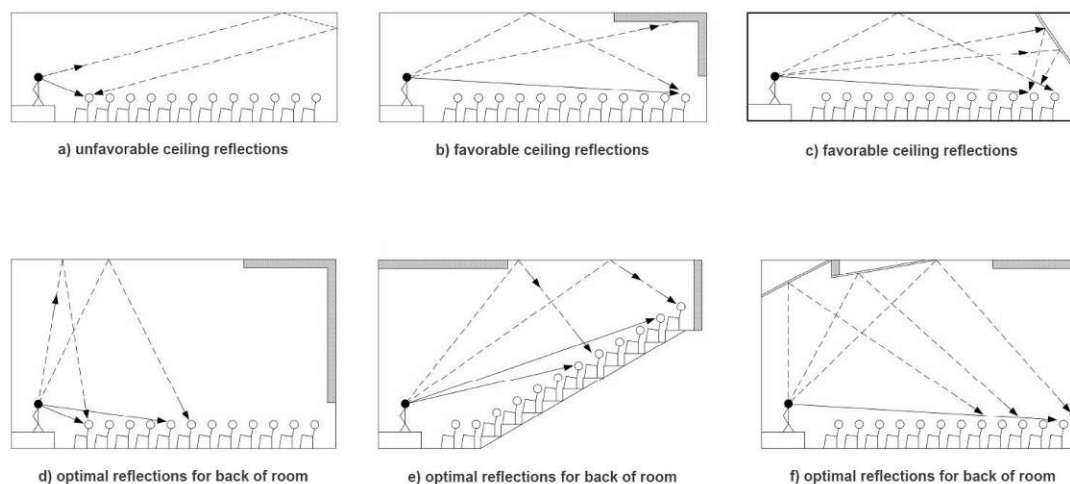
Display of back wall and ceiling reflections in rooms longer than 9 meters according to ÖNORM B 8115-3, 2005
